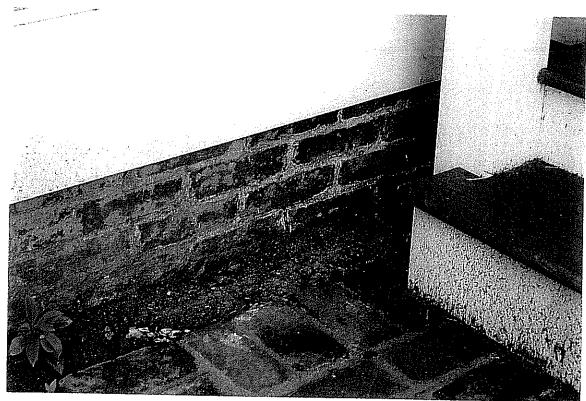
Montgomery Ave., east side detail at window wells, view to side porch
